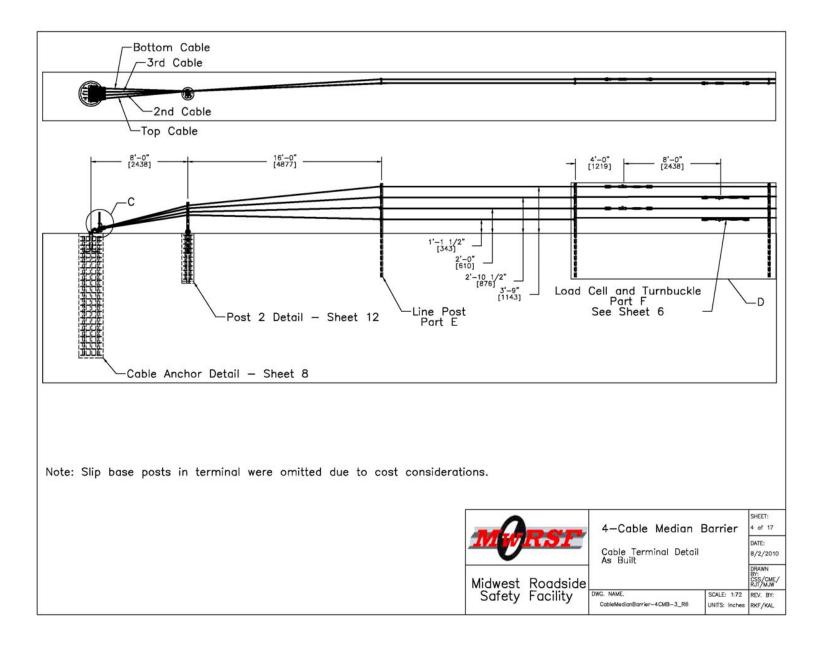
Cable Terminal Detail, Test No. 4CMB-3
